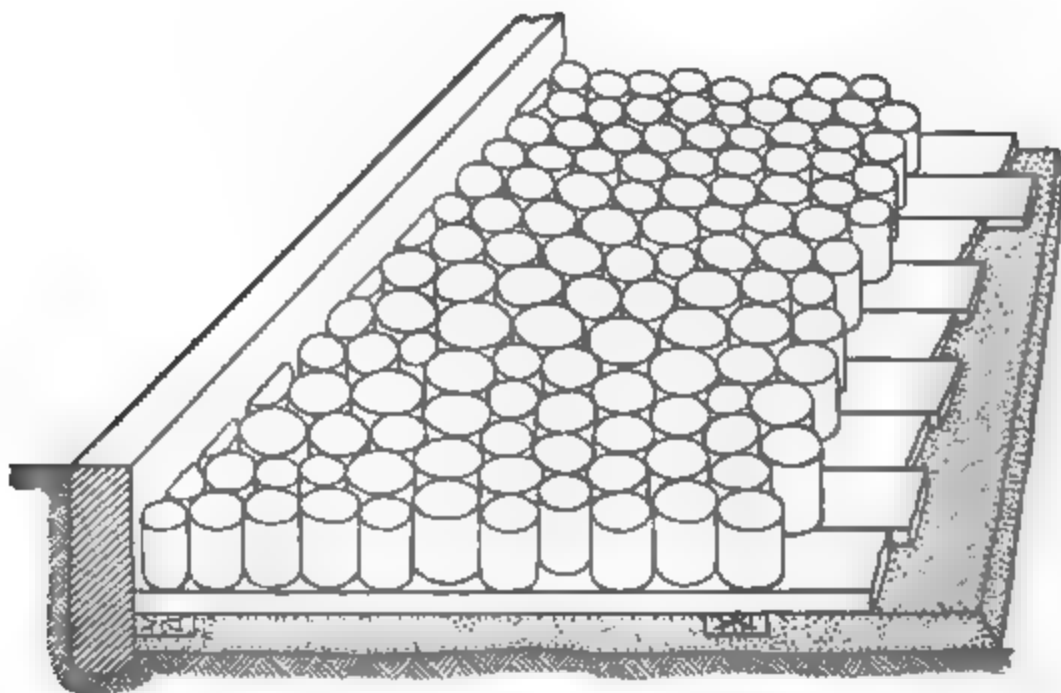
ROUND WOOD-BLOCK PAVEMENT.
